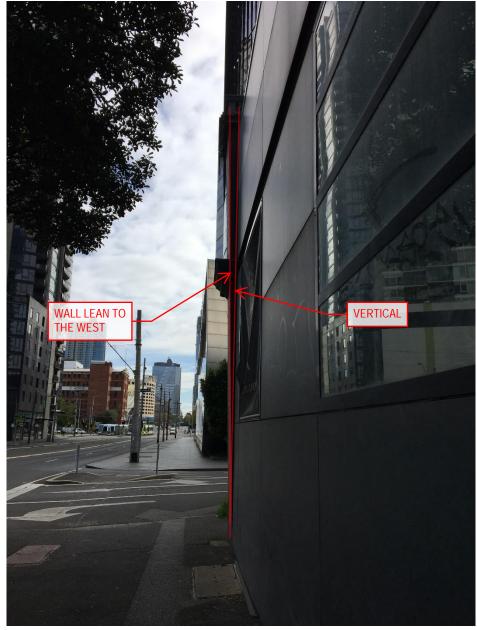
The masonry façade wall at the corner of Clarendon and Haig Street leans approximately 2 degrees to the west.
